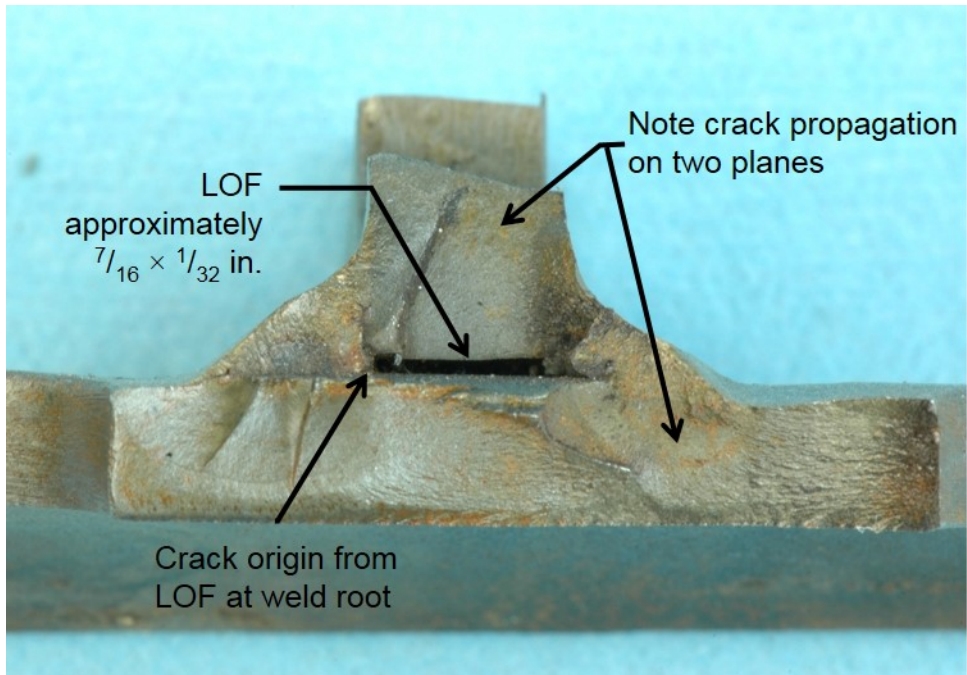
Fracture surface photographed perpendicular to the camera to clarify the LOF — crack to the north of rib
